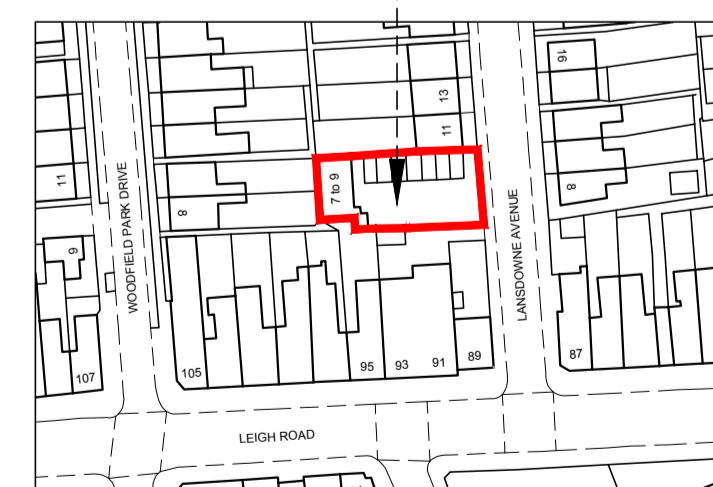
/9 LANSDOWNE AVE (APPLICATION SITE)
